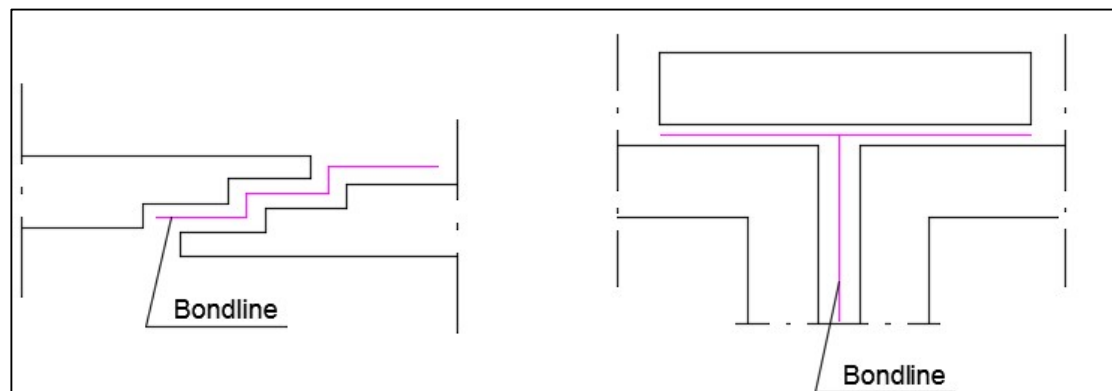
Adhesive connection possibilities for bearing deck structural system.
